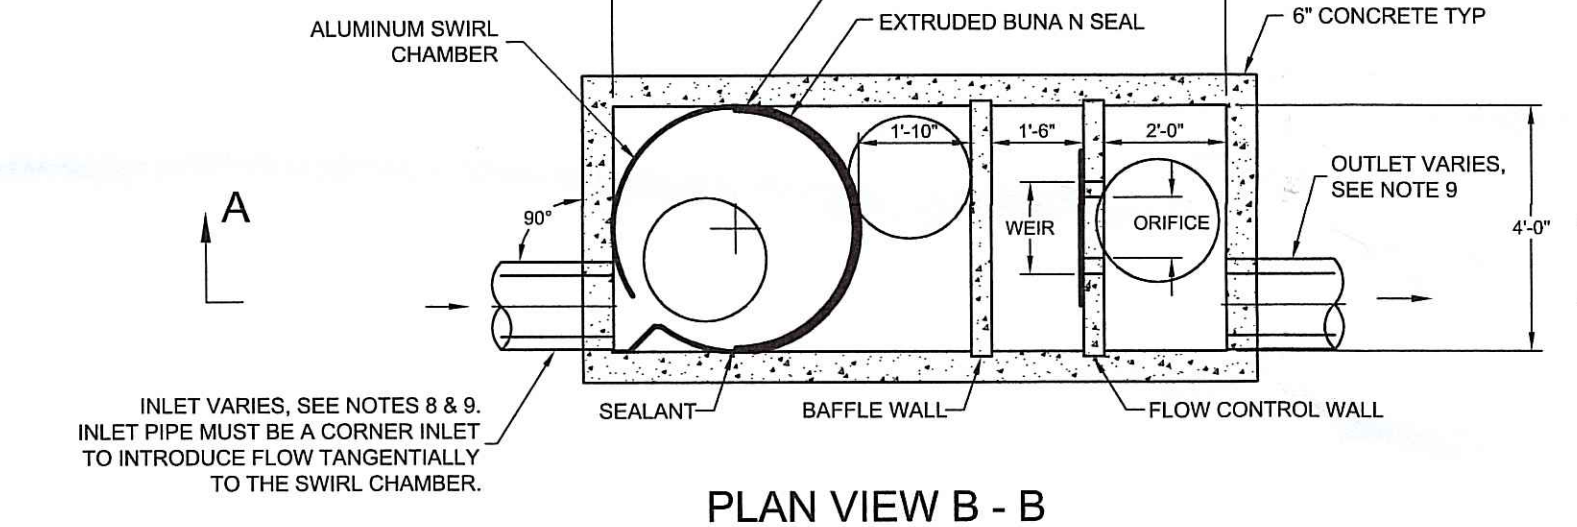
DETAIL RECHARGER V8HD HEAVY DUTY "THREE" VIEW
